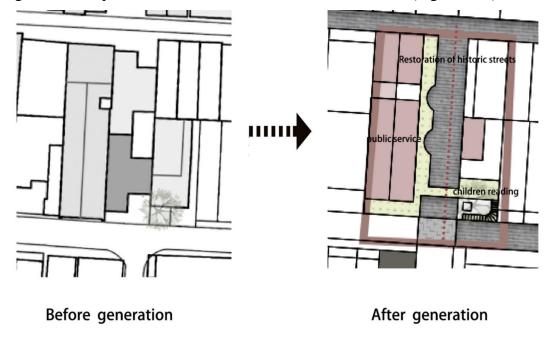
Qing Dynasty street node renovation plan (Source: Self-drawn)
